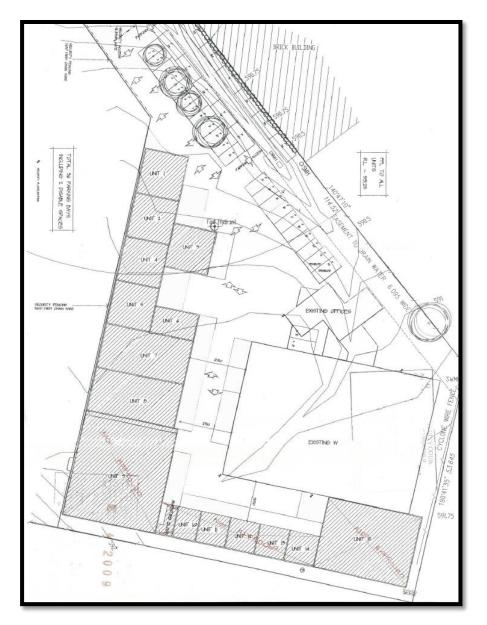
Approved plan showing Units 1-8 approved and Units 9-15 noted as not approved.
